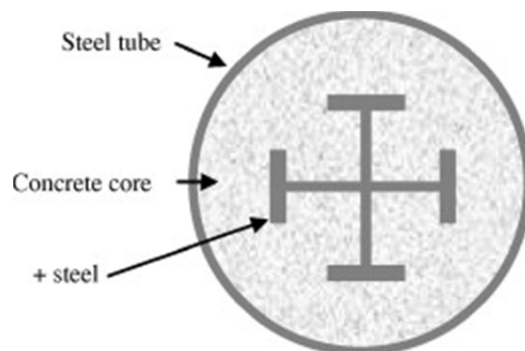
Concrete filled steel tubular column cross section (Chang et al, 2012)
